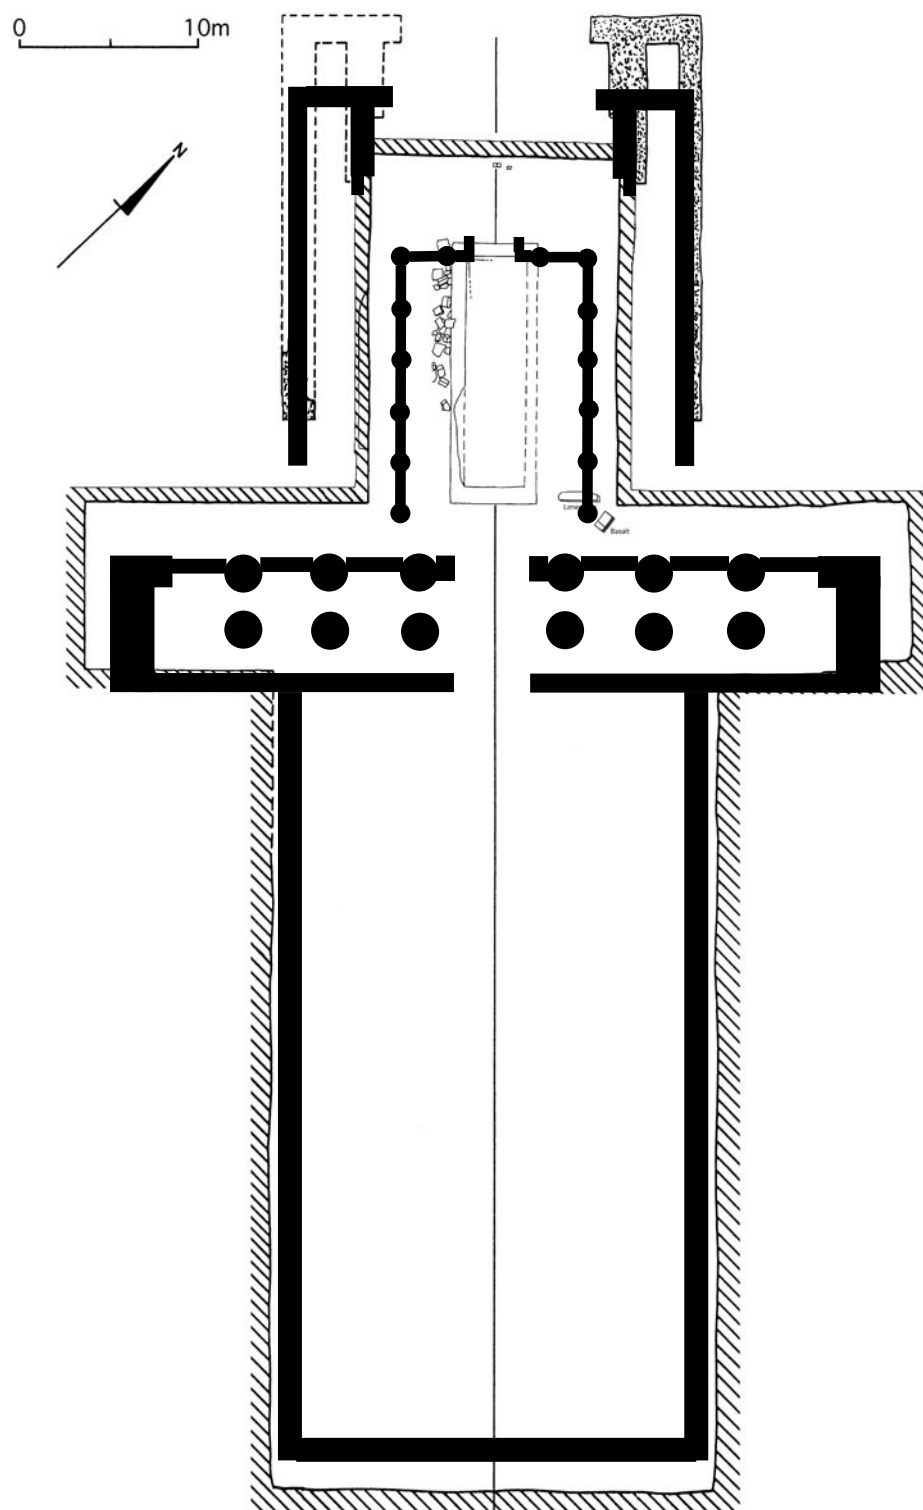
Plan showing the outline of the foundation superimposed with a reconstruction of the temple.
